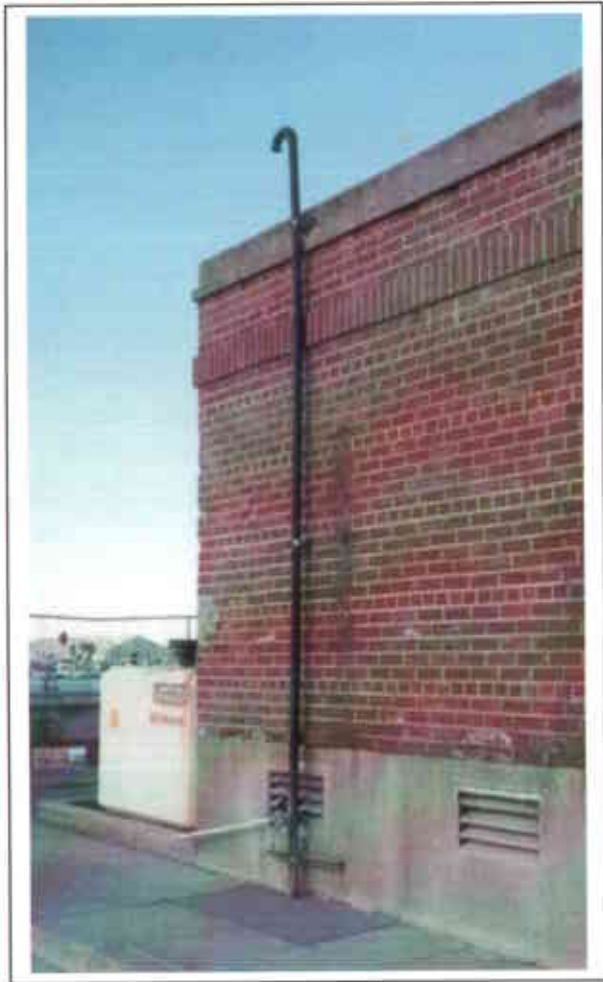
Filled in holes on side walk where piping had been removed. Southeast side of Building 44.
